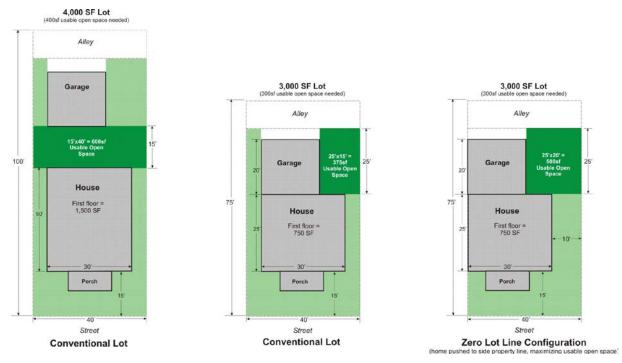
(f)(1). Examples of how to meet open space requirements for alley-loaded lots.
